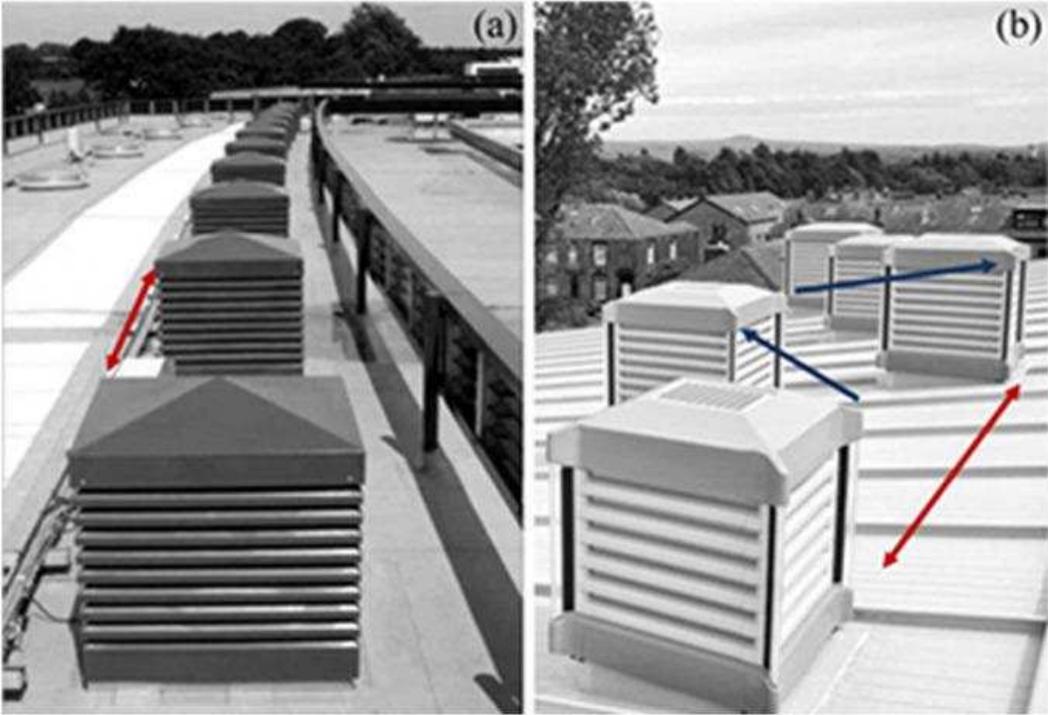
Roof mounted windcatcher (a) parallel arrangement (b) staggered arrangement [16].
